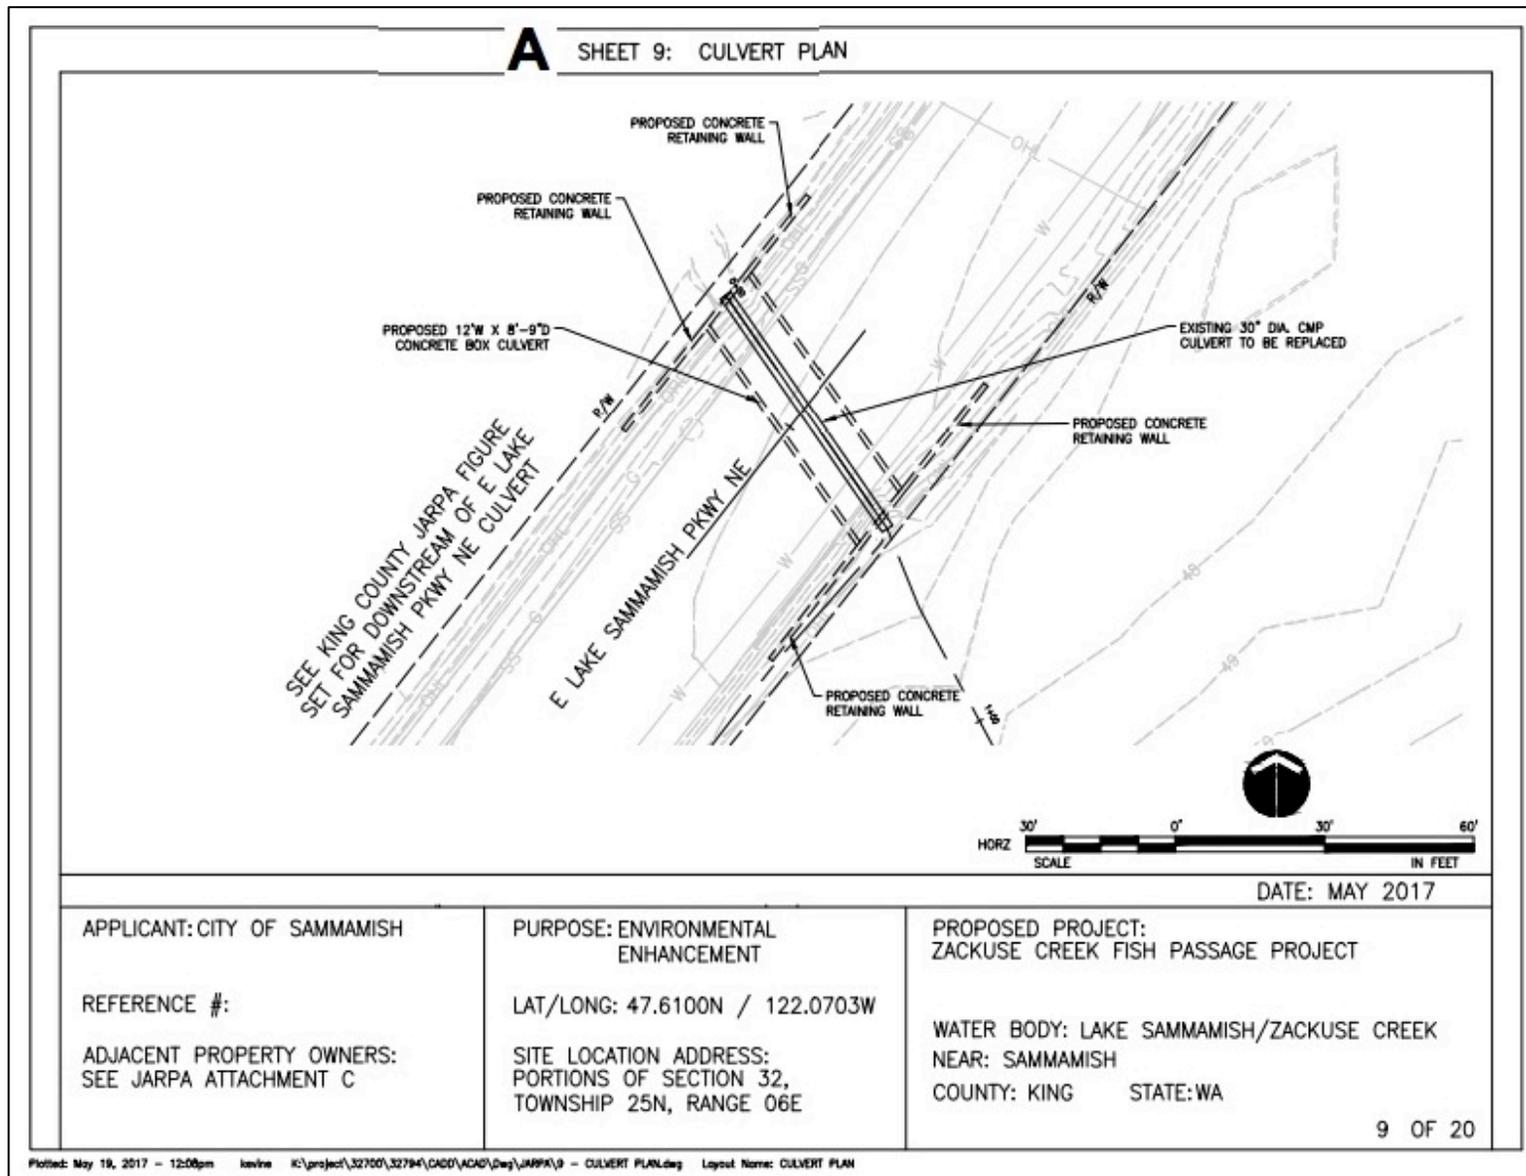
Project plans – culvert plan, provided by Otak, Inc.
